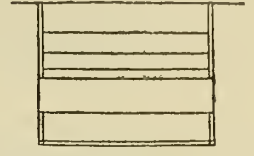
PLAN OF STAGES FOR SHORT LEAN-TO HOUSE.
